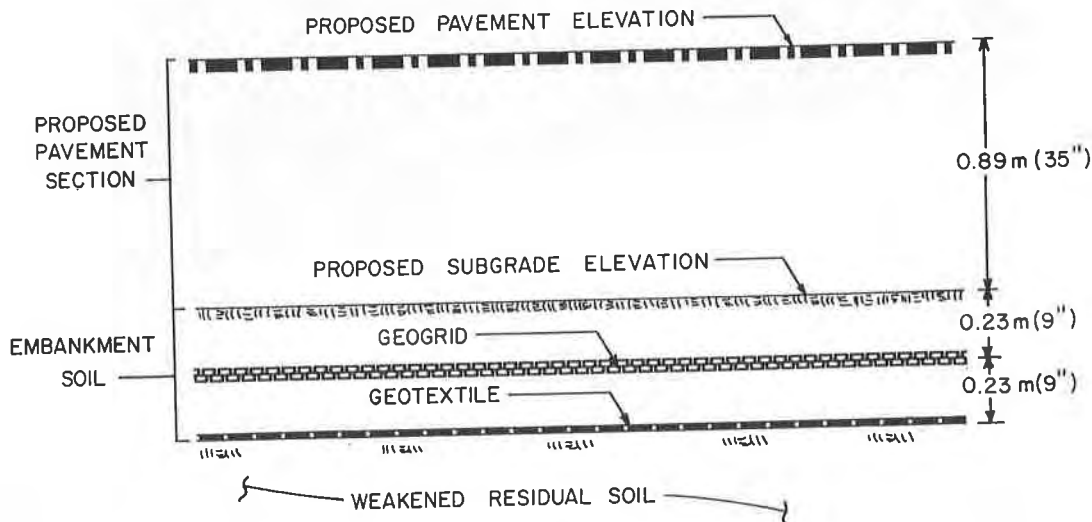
Subgrade stabilization cross-section, ABE International Airport.
